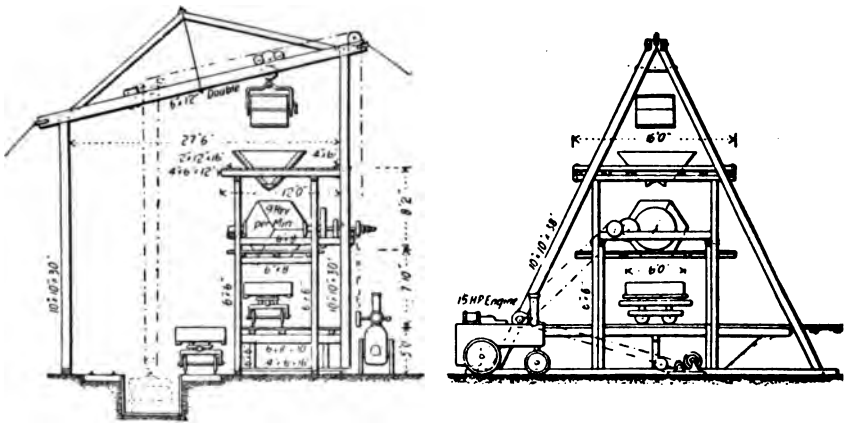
Mixing Plant, Illinois & Mississippi Canal Lock Work.
